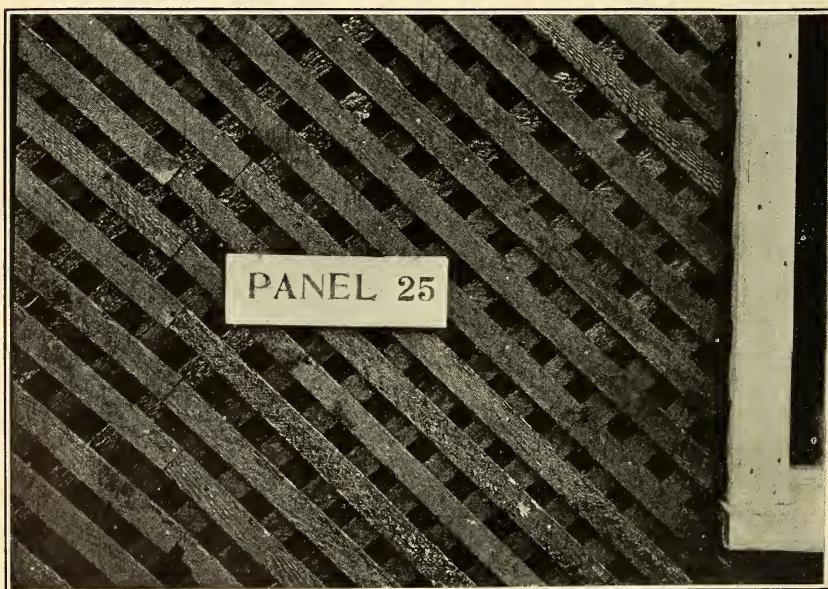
Wood lath, counter lathing, on panel No. 25. Similar construction on panels Nos. 21, 22, 23, and 24
